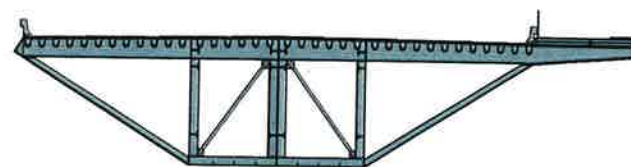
Skyway, Uniform Depth Steel Single Cell Girder with Orthotropic Deck (Section Elevation)
